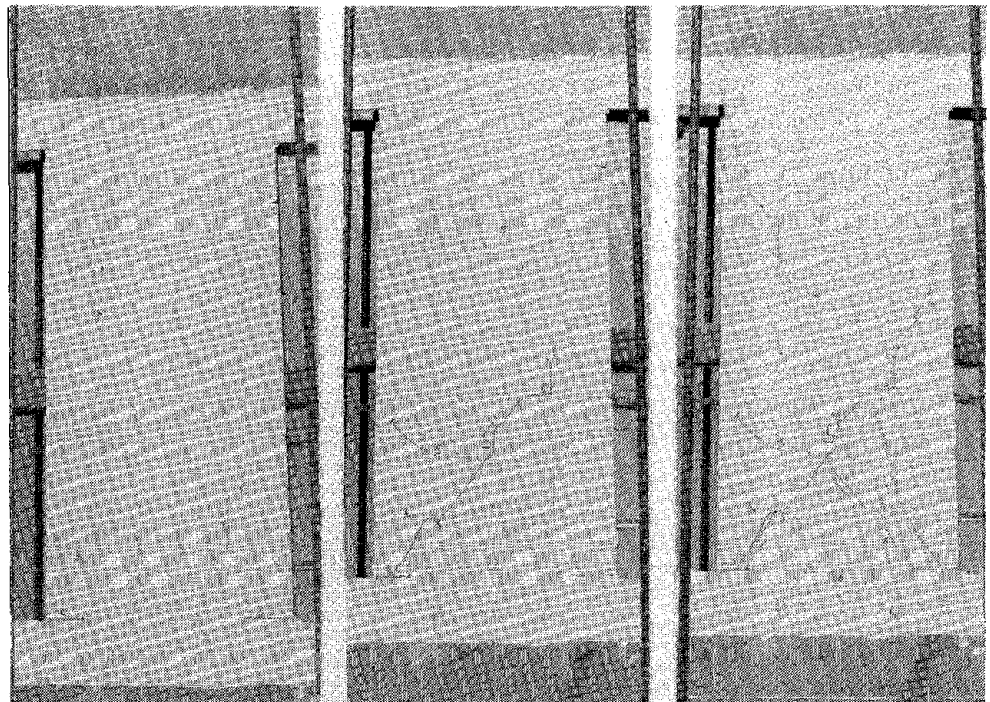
SUCCESSIVE CRACK FORMATION TEST 5. (RIGHT SIDE PIER)
